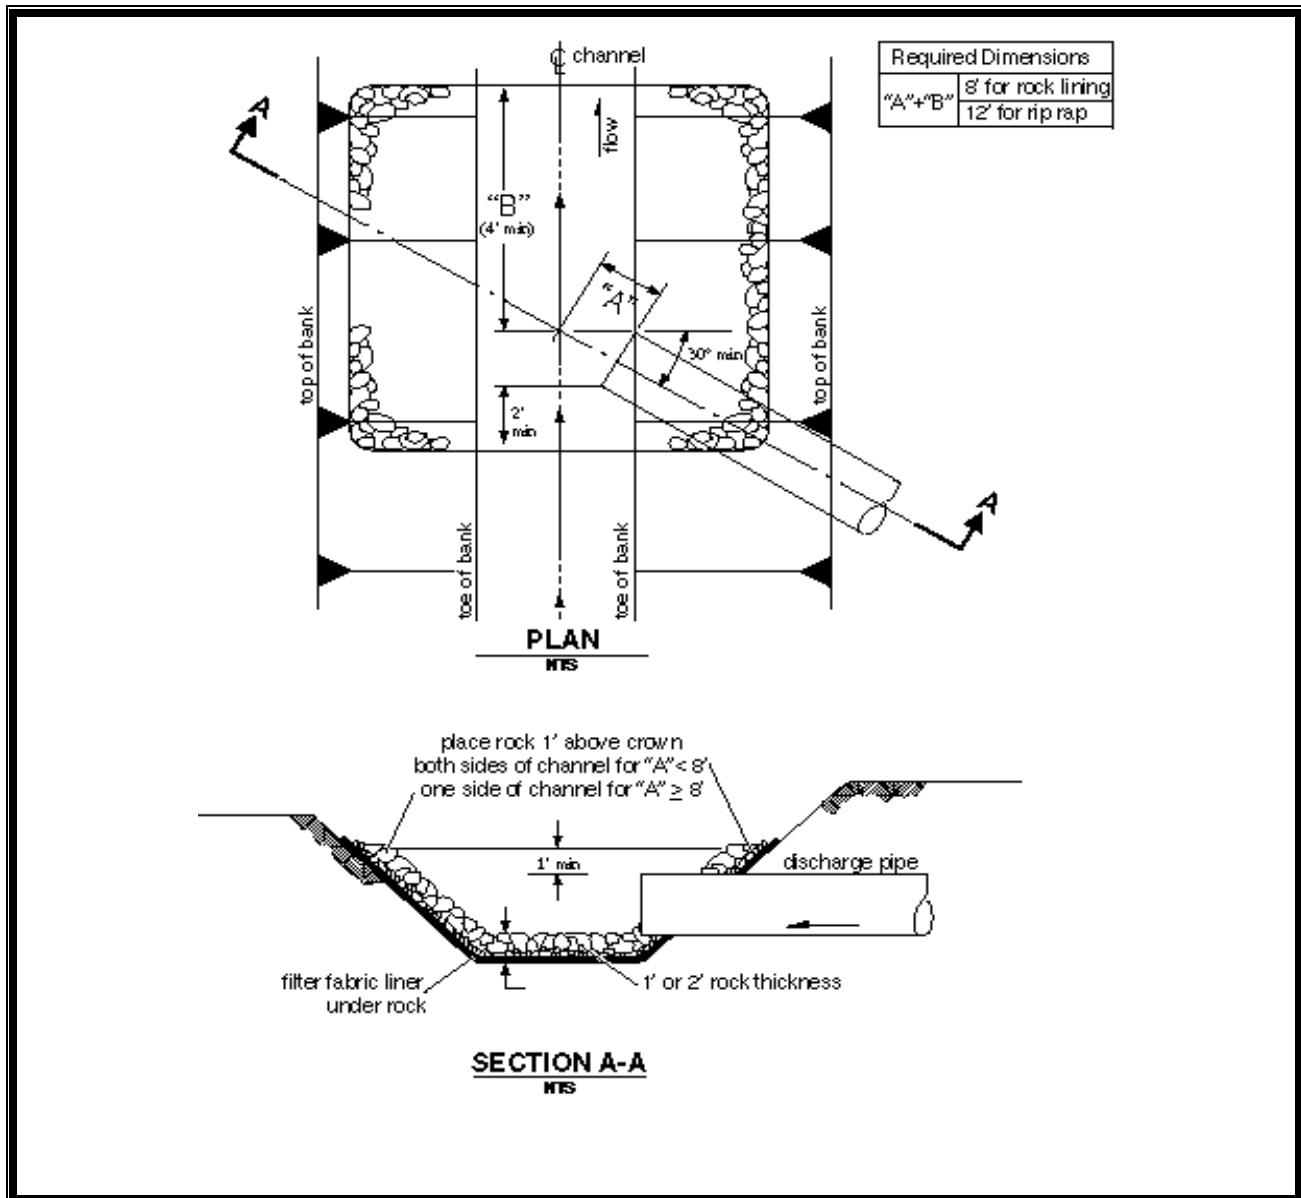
Pipe/Culvert Outfall Discharge Protection.
